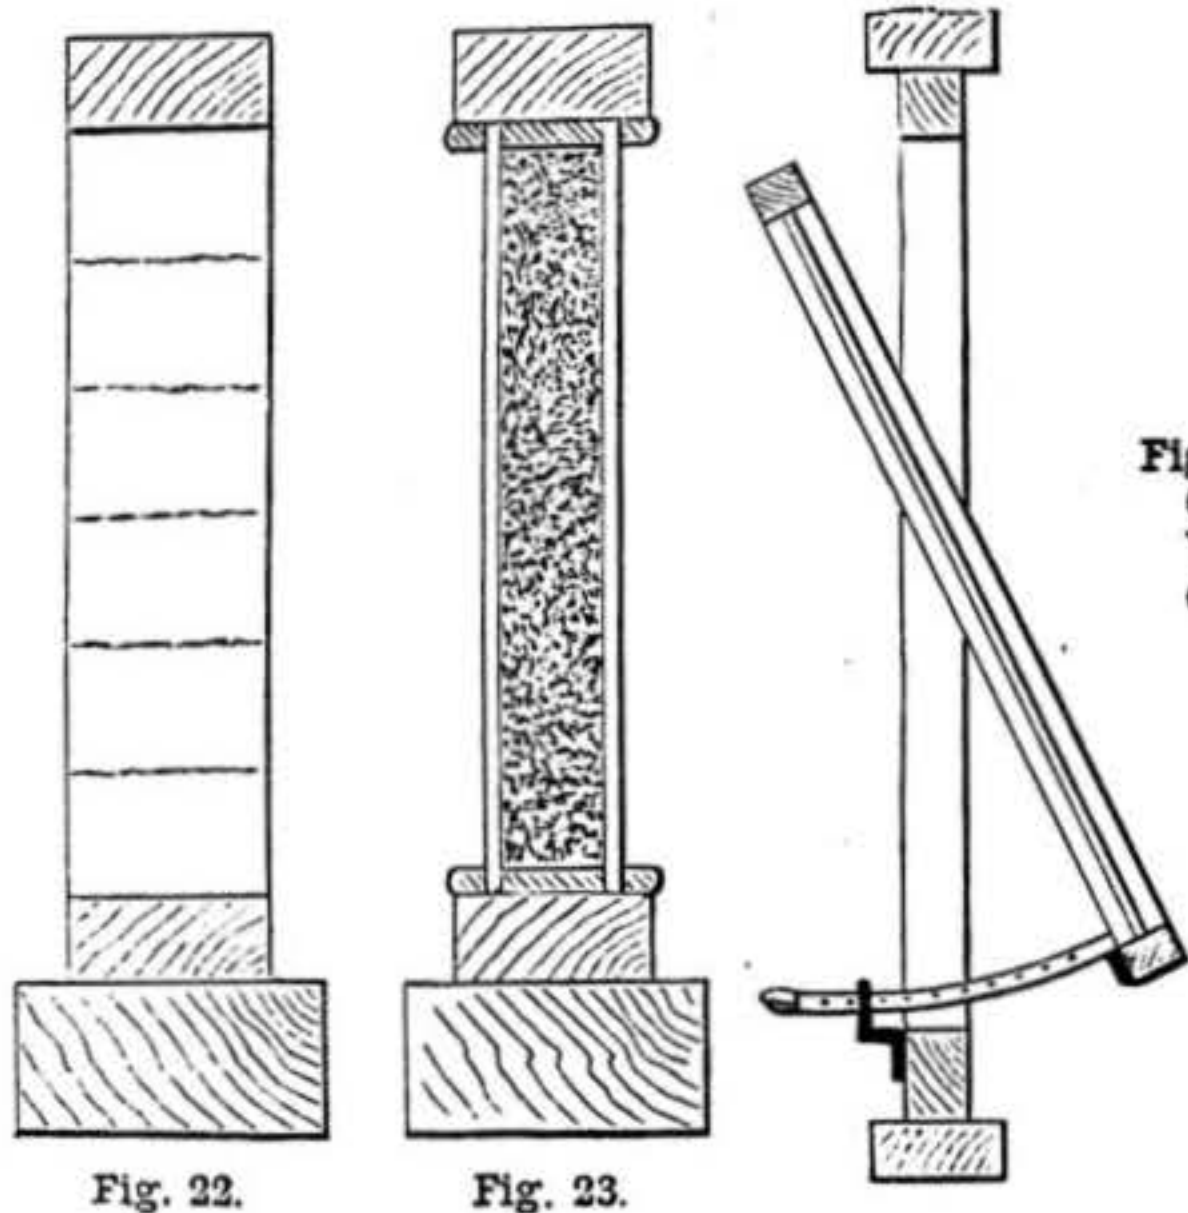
Alternative Mode of Filling in between Sill and Sashes with Brickwork.
